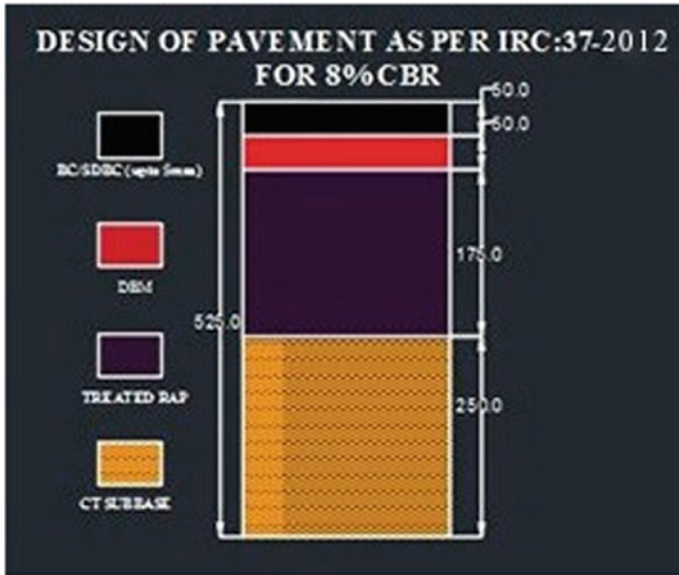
Design of pavement Cross-section 4 as per IRC:37-2012 for 8% CBR in mm
